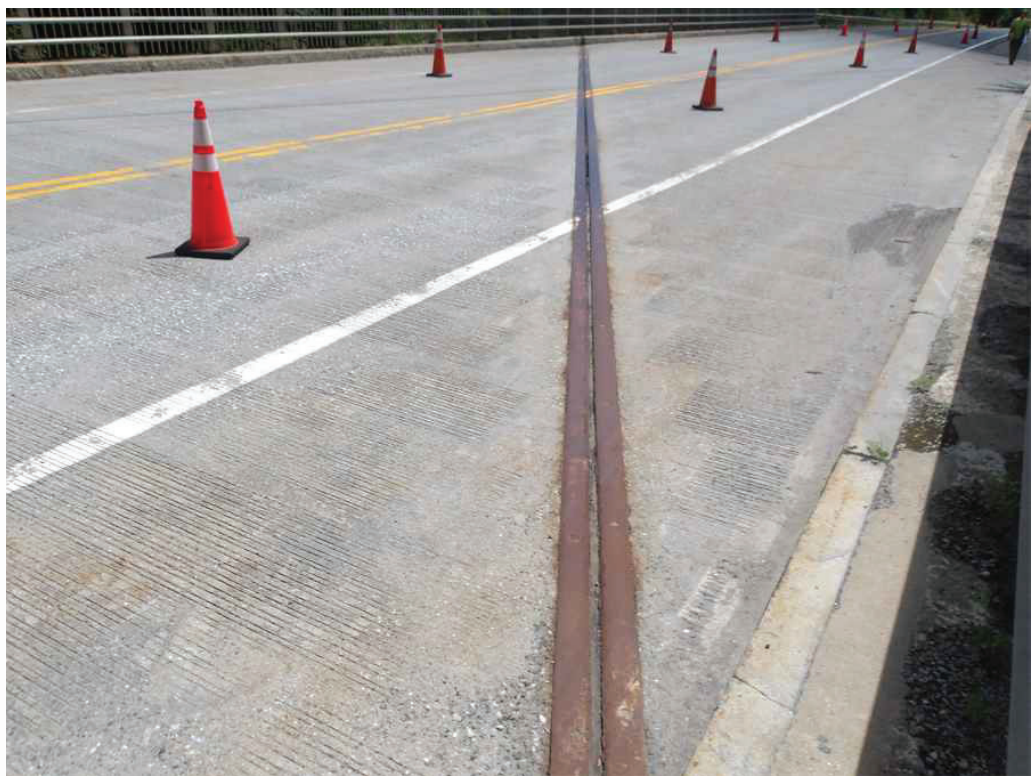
Pier Deck Joint, looking northeast. Note the rust on the steel headers, buildups of sand, and depressed joint material with tears.
